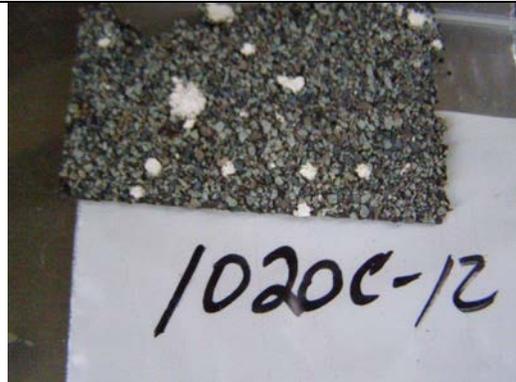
Roof Shingle (1020C-12) Exterior. No Asbestos Detected.
